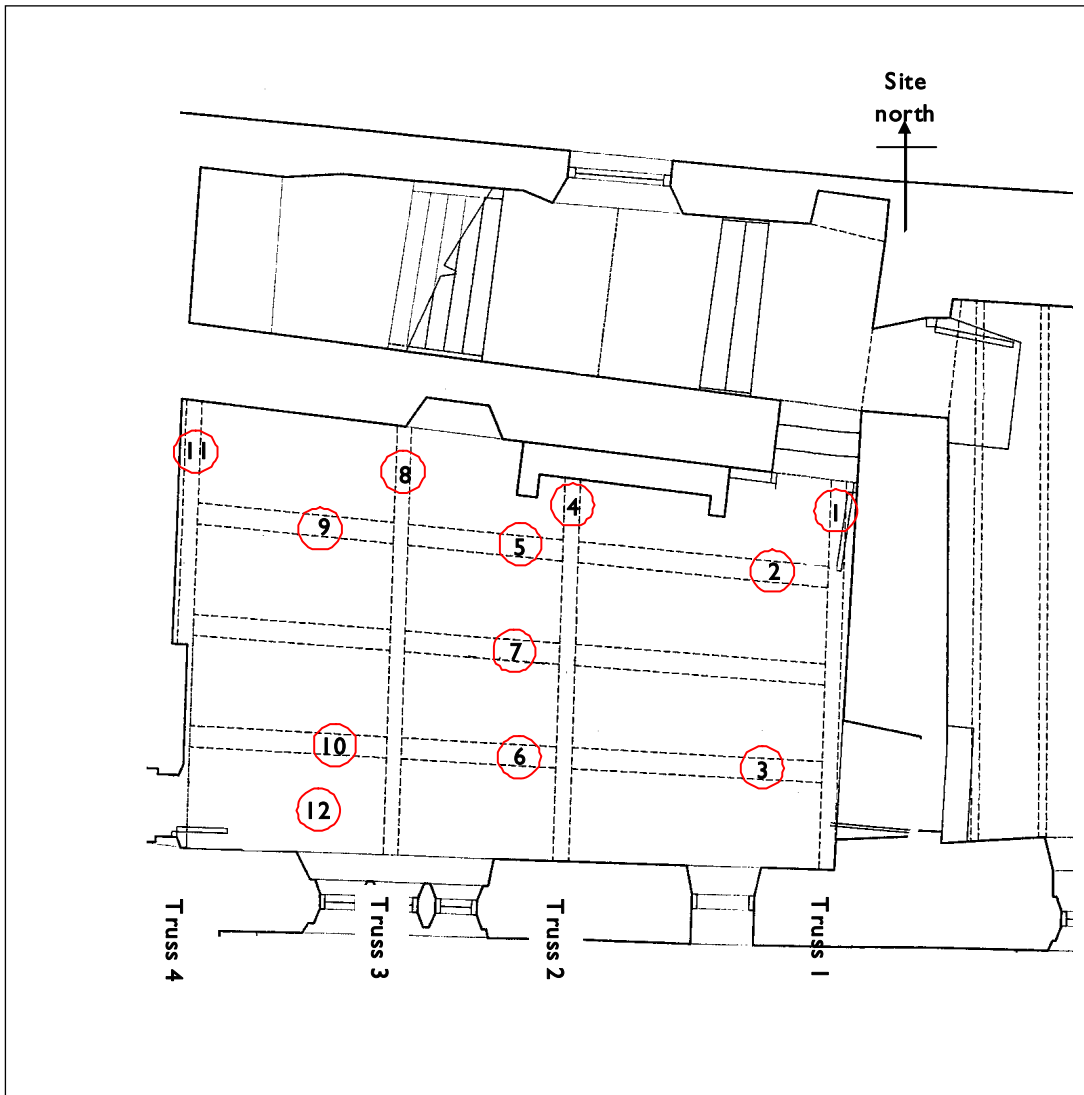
Plan of roof to bedroom 2 (now the office) to show sampled timbers (after Peter Ryder)
